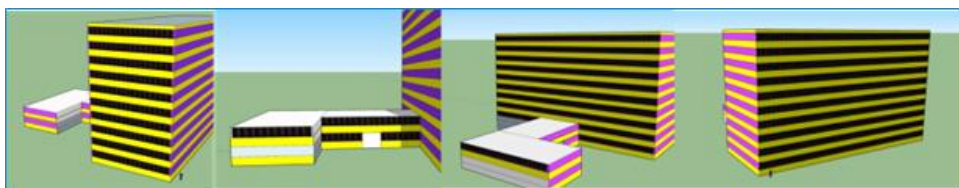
Façades panels are placed: main south façade, secondary south façade, west and east façade.
